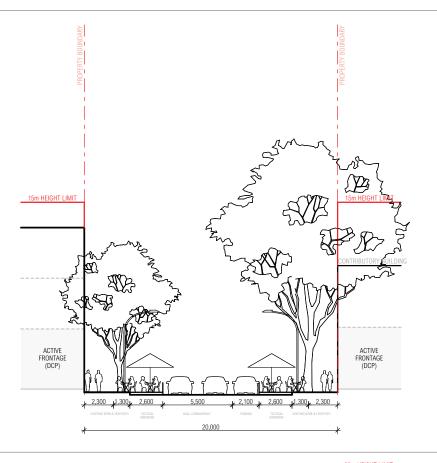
Indicative street section – Wyndham Street, North Alexandria
